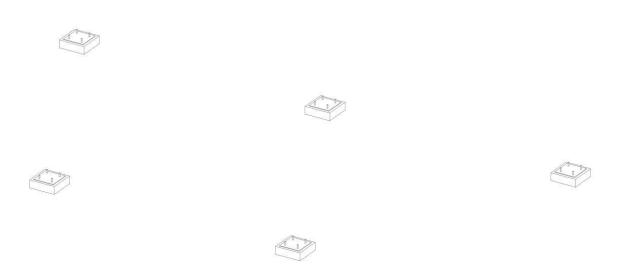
step one, the heavy concrete blocks with base plate and waiting bars are located on the flat platform
